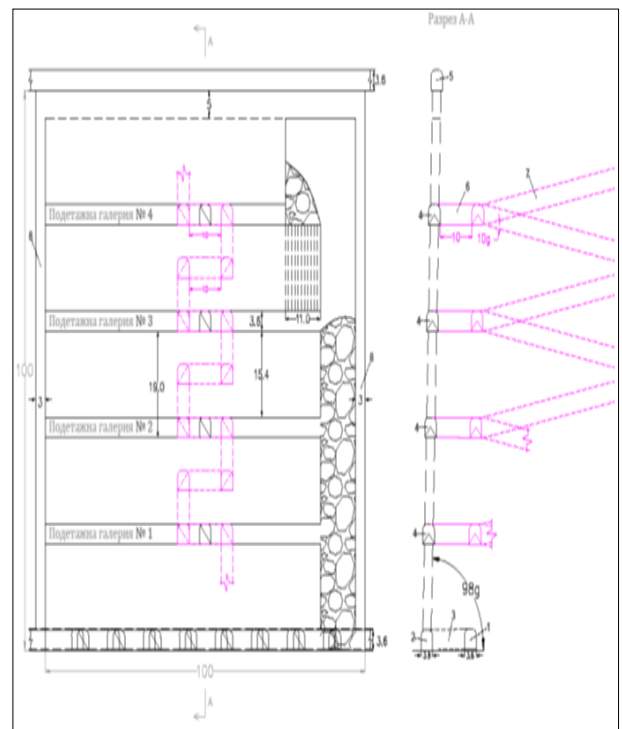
Version II. Legend: 1 – haulage level drift; 2 – trench gallery; 3 – loading pocket; 4 – sublevel roadways; 5 – ventilation level drift; 6 – cross cuts to main passages; 7 – main entry; 8 – barrier stope
